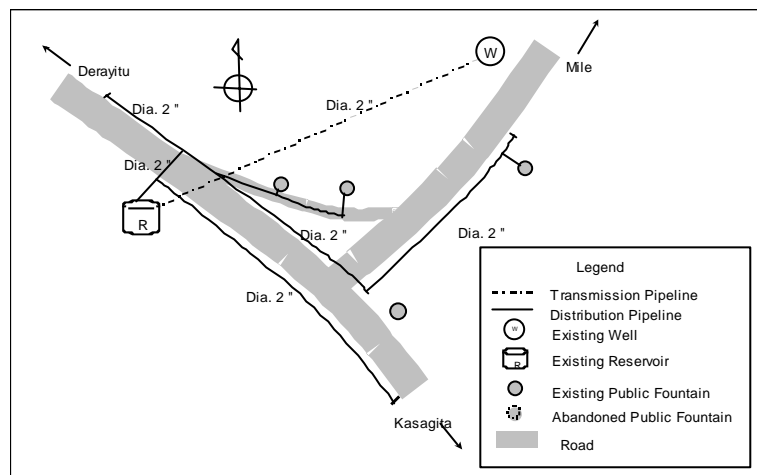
Layout of Existing Facilities of Chifra
